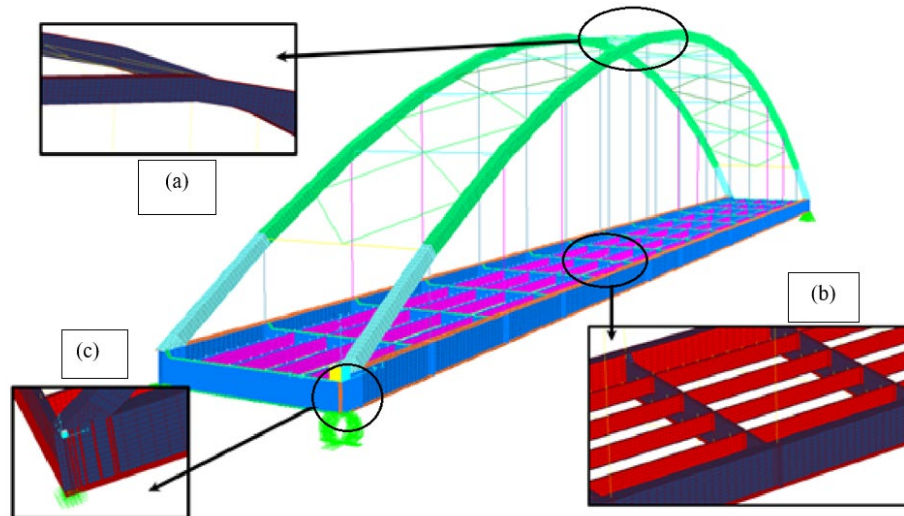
Finite element shell elements simulating the structural stiffness of a) arch elements, b) slab and hangers, and c) stiffened plate girders
